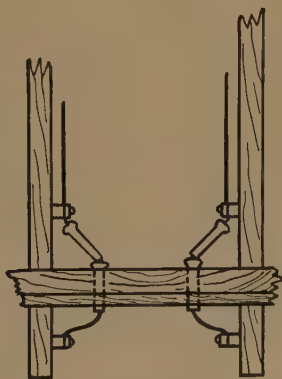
A sketch showing a run thru a floor where additional tubes are used to protect against plaster droppings.
